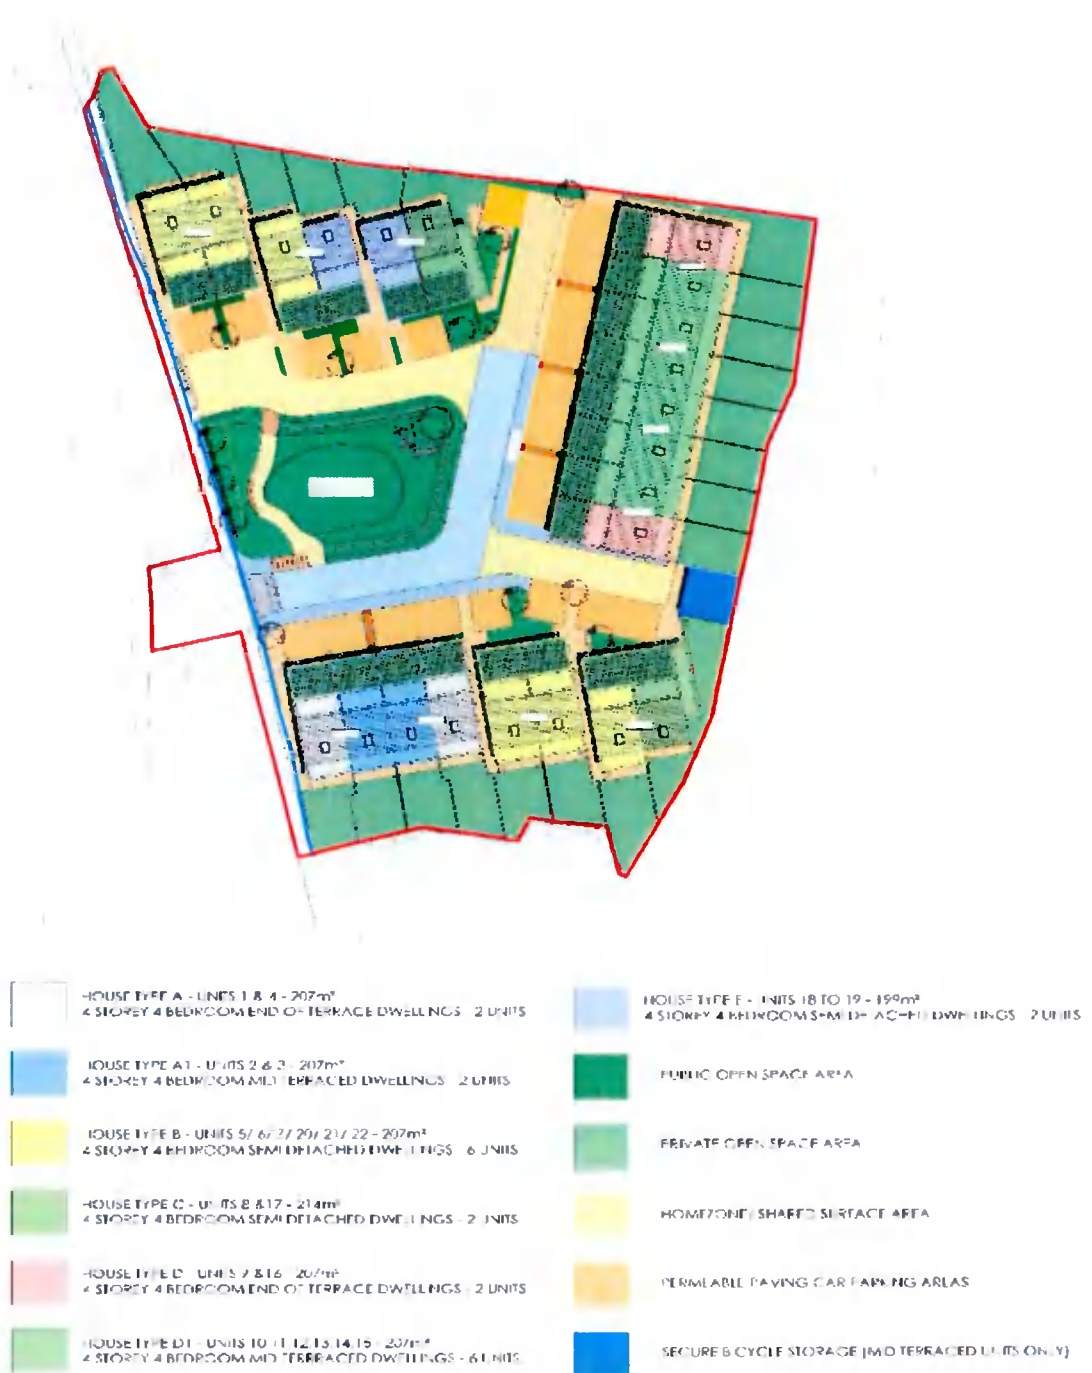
D-122-PL-SL-102 – Proposed Site Layout legend - Drawing produced by bba architecture
